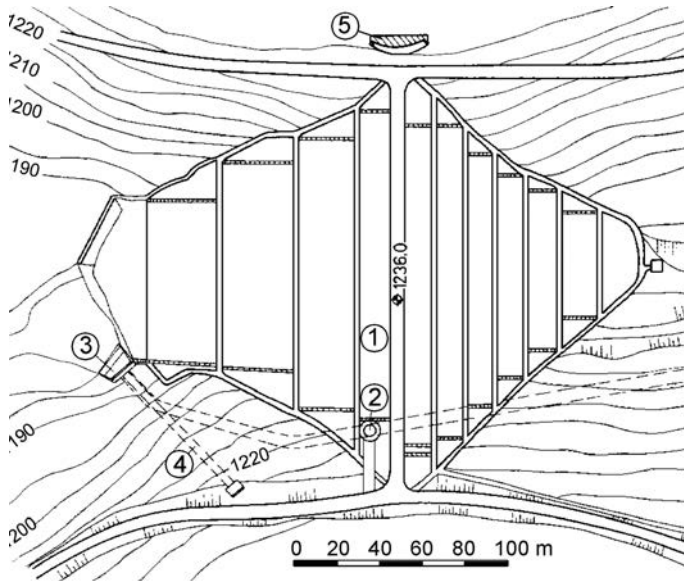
Layout plan of the Mavrovo dam. (1) The dam's body; (2) gate chamber; (3) water-intake structure; (4) sloping ramp; (5) observation platform.
